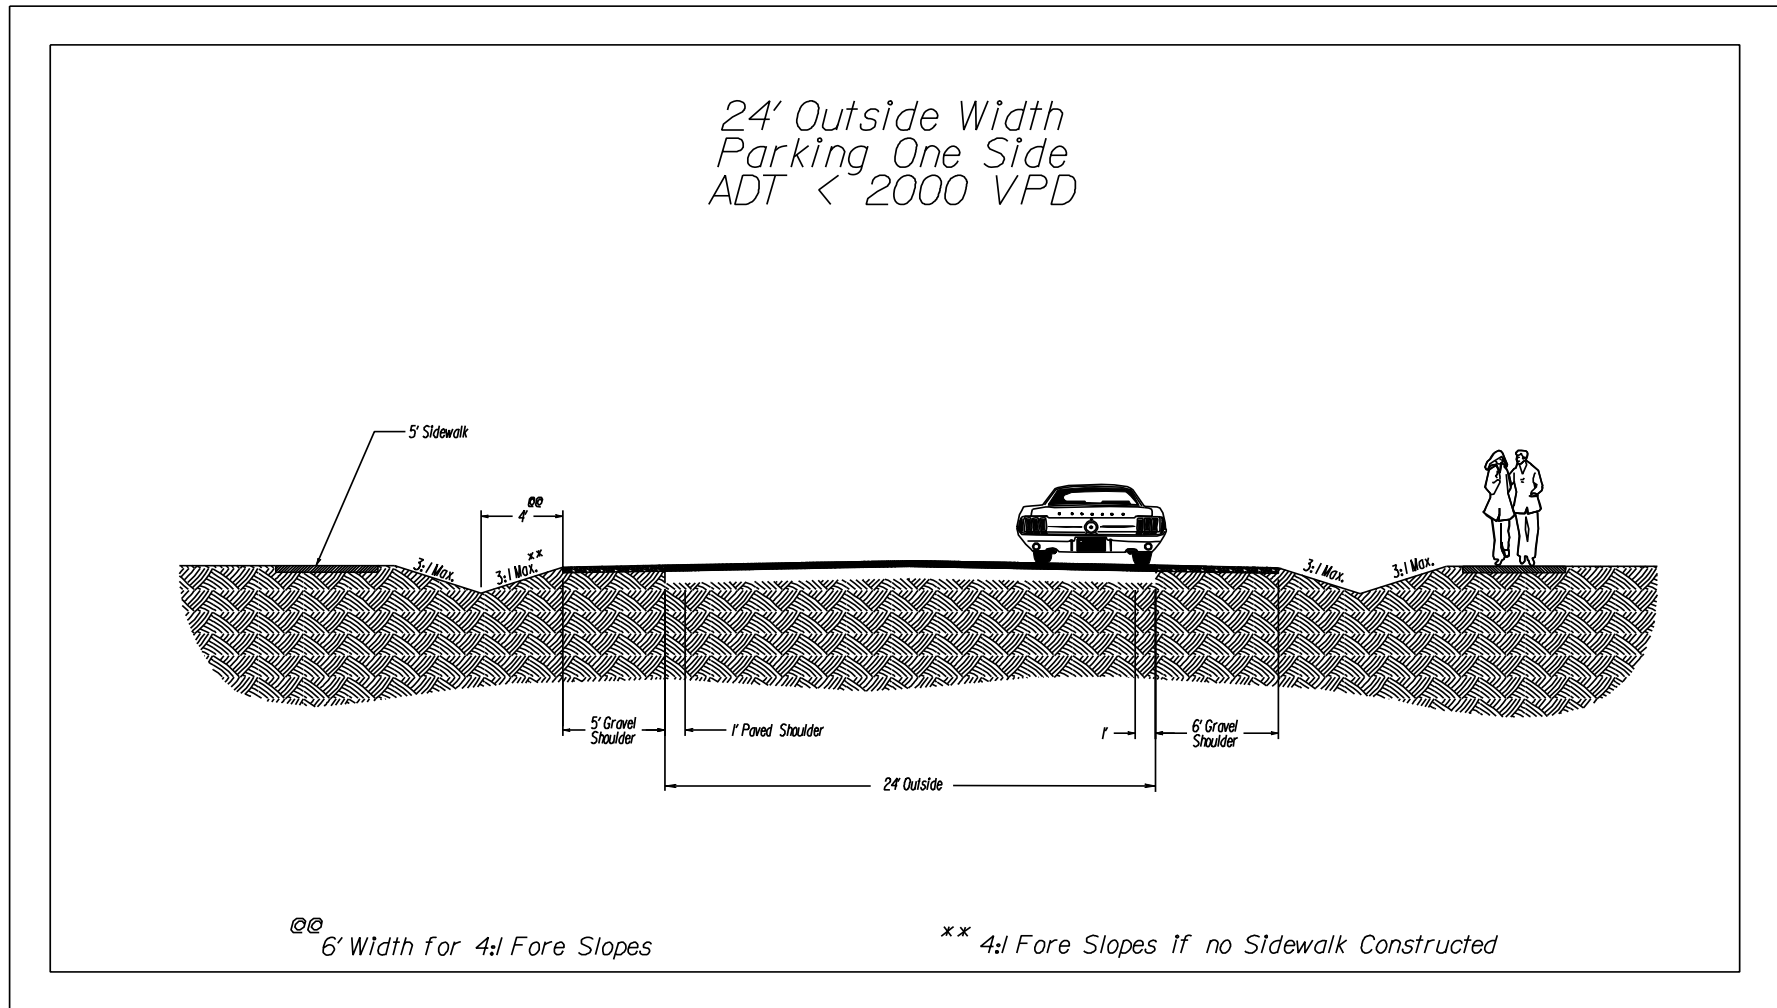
24' OUTSIDE WIDTH PARKING ONE SIDE
